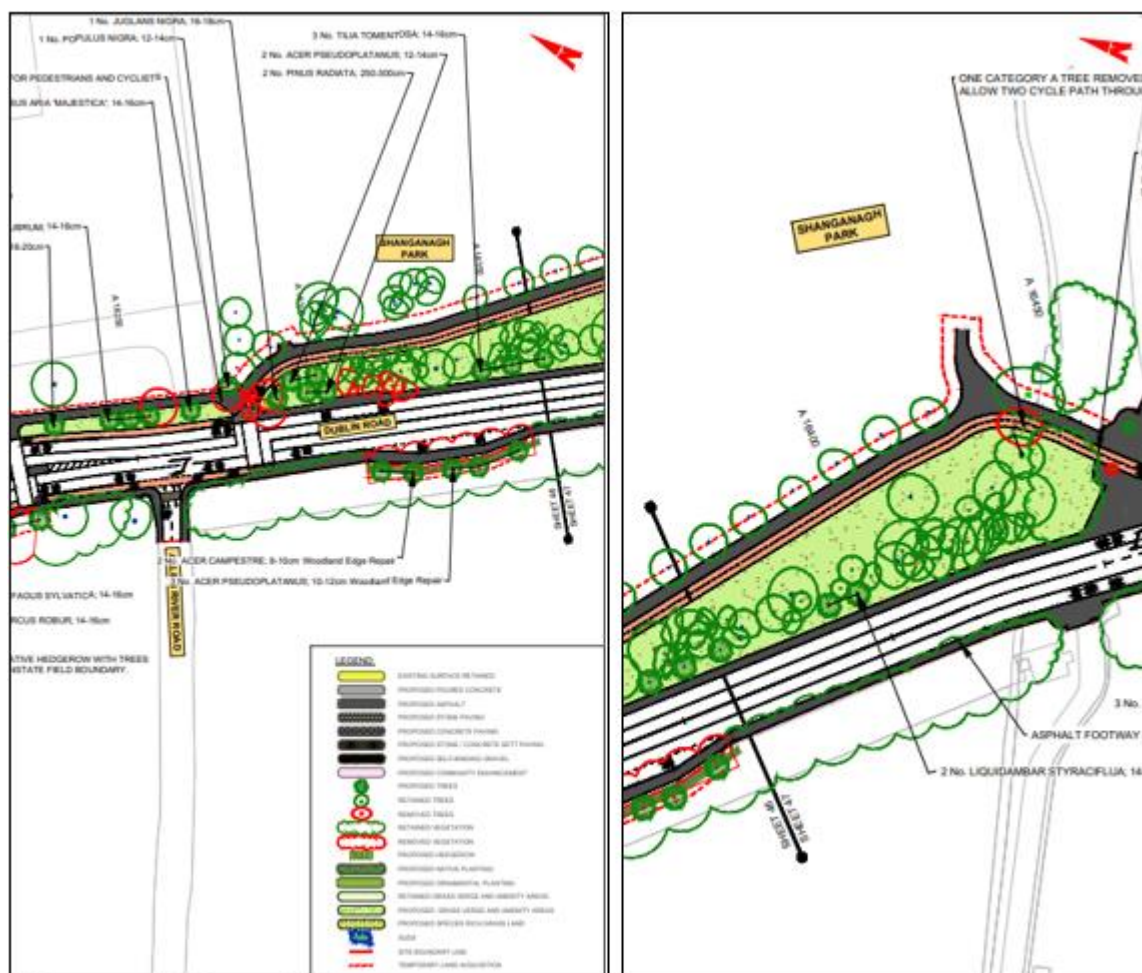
Extract from Landscaping General Arrangement Drawings on Dublin Road (Sheet 46 & 47)
